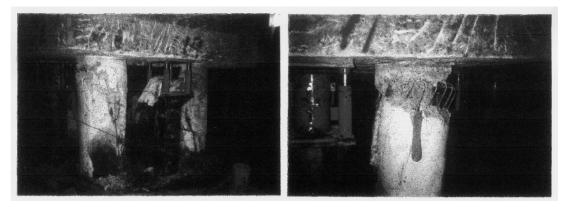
Damage of pretensioned spun concrete piles in 1995 Kobe earthquake
